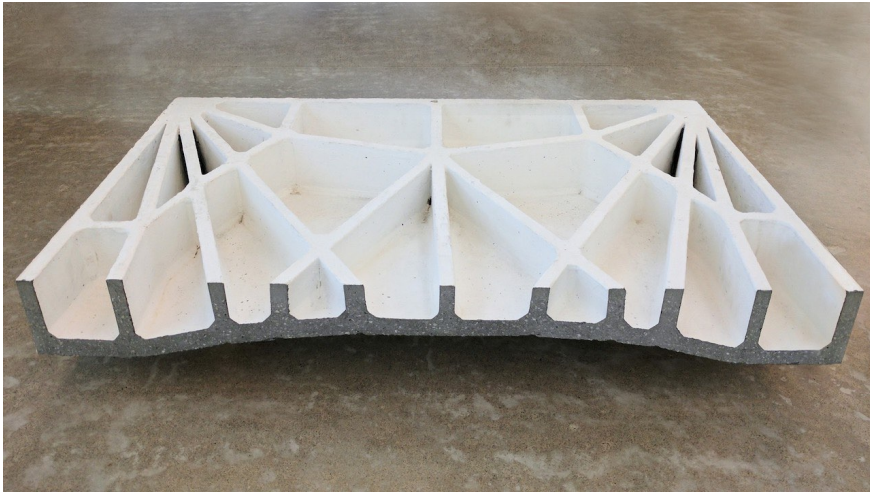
Rib-stiffened funicular floor slab (photo credit: Block Research Group, ETH Zürich).
